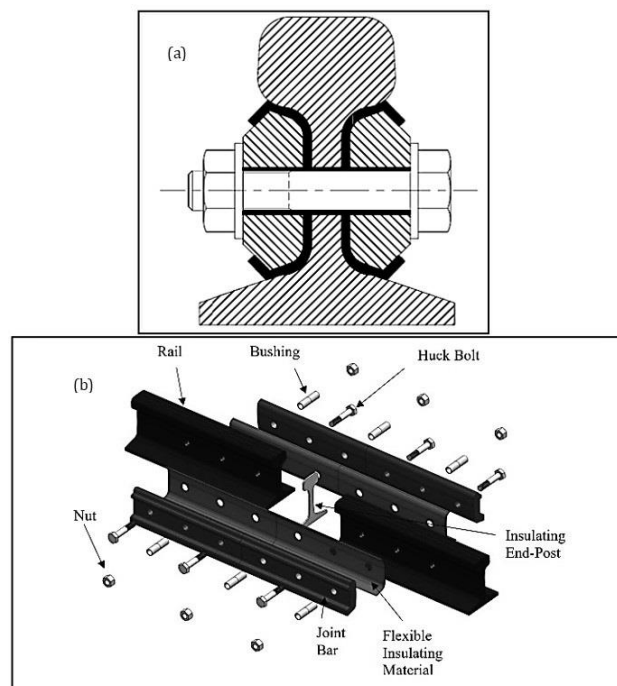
Typical insulated joint assembly (a) Cross section; (b) Exploded view (Elshukri, 2016)
